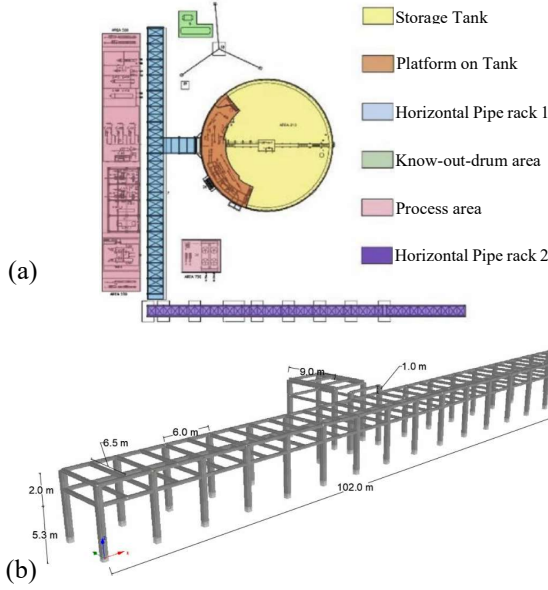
(a) The LNG terminal plant and pipe rack in CS #2; (a) The LNG terminal layout ([35]), and (b) the RC pipe rack modeled by Seismostruct code.
